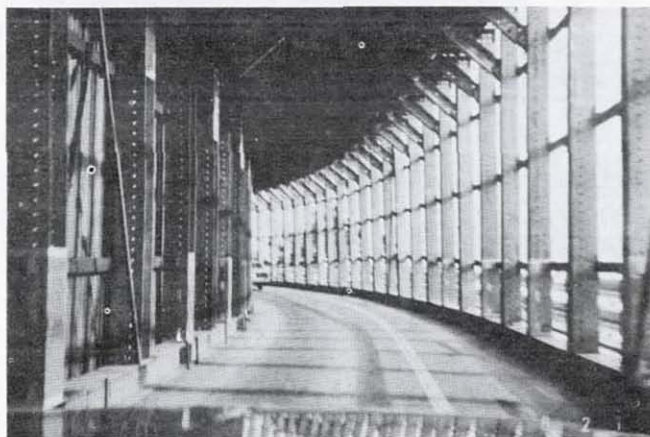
Temporary Structure to Prevent Rock Fall on the Higashi-izu Toll Road
